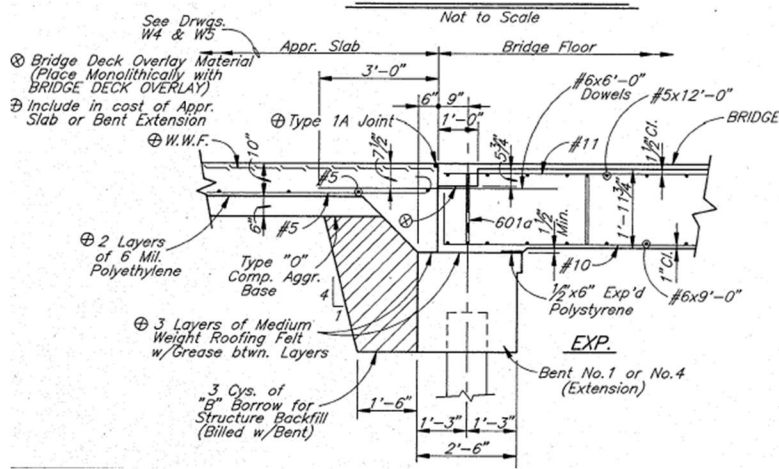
Abutment Detail of Bridge at Added Column (NBI 14650) (1991)
